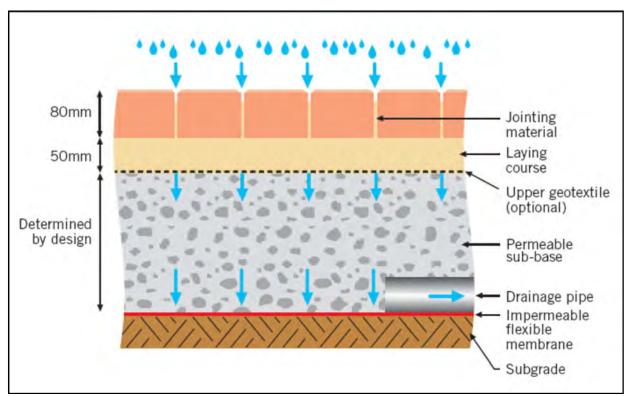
Section through a permeable surface (Source: Interpave Permeable pavements – guide to the design construction and maintenance of concrete block permeable pavements dated 2010)
